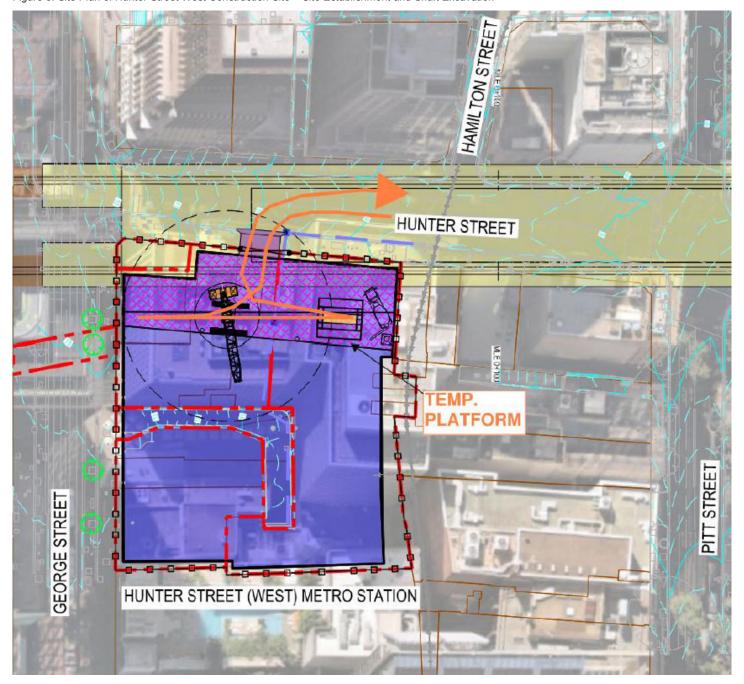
Site Plan of Hunter Street West Construction Site - Site Establishment and Shaft Excavation
